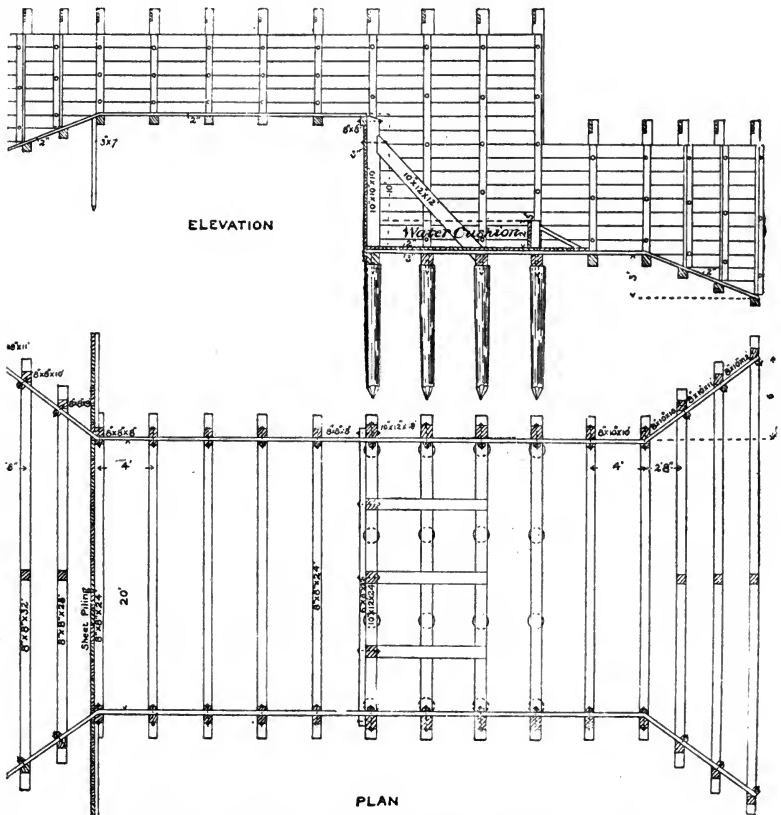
PLAN AND CROSS-SECTION OF FALL, BEAR RIVER CANAL.
